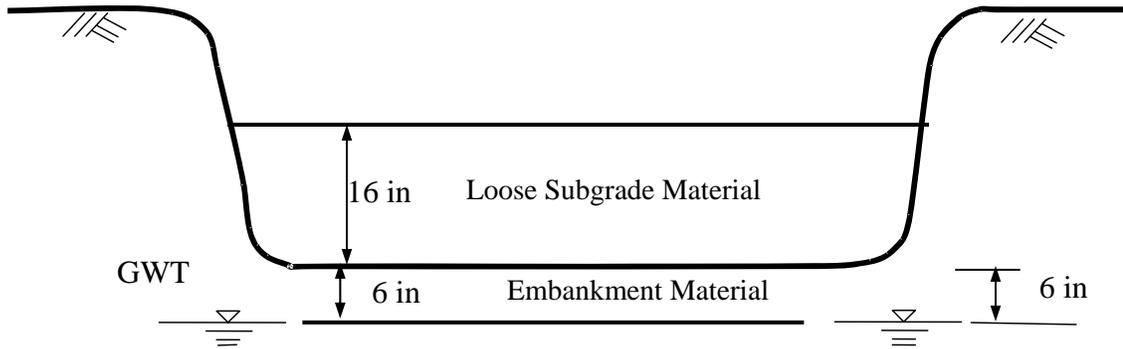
Schematic Site Plan for Compaction of Case A3 (Lake Worth Site)
